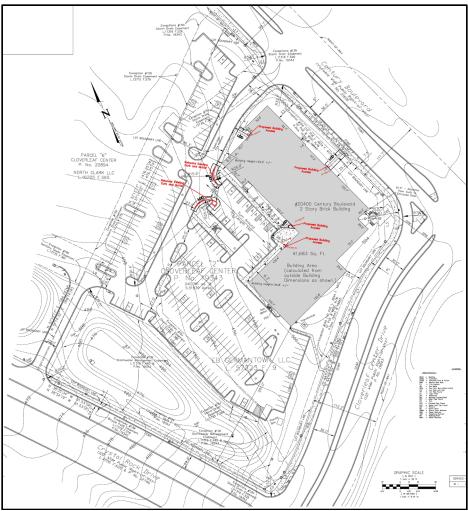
Proposed Preliminary Plan 11988156B and Site Plan No. 81990060C
